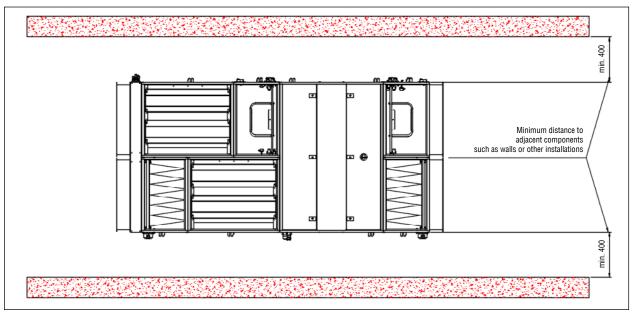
Space required for assembly, disassembly, maintenance and adjustment work
